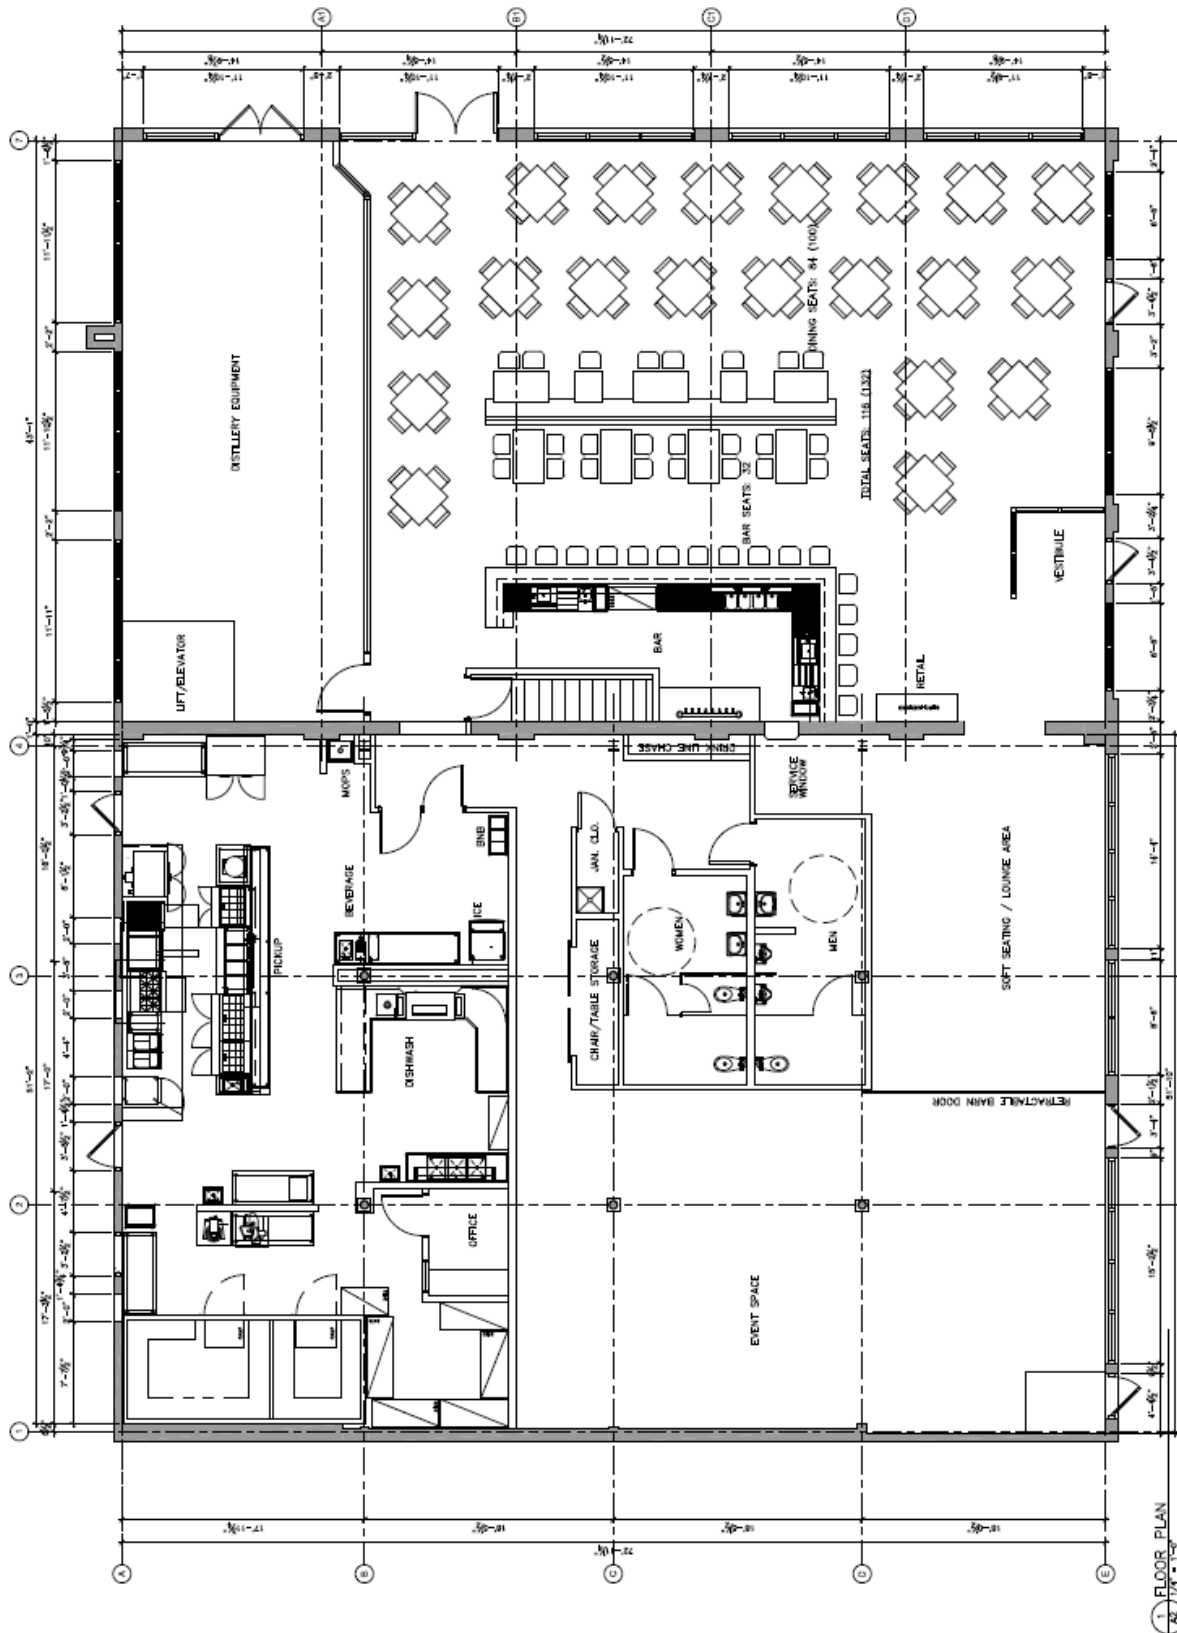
EXHIBIT D: FLOOR PLAN (MAIN LEVEL)
